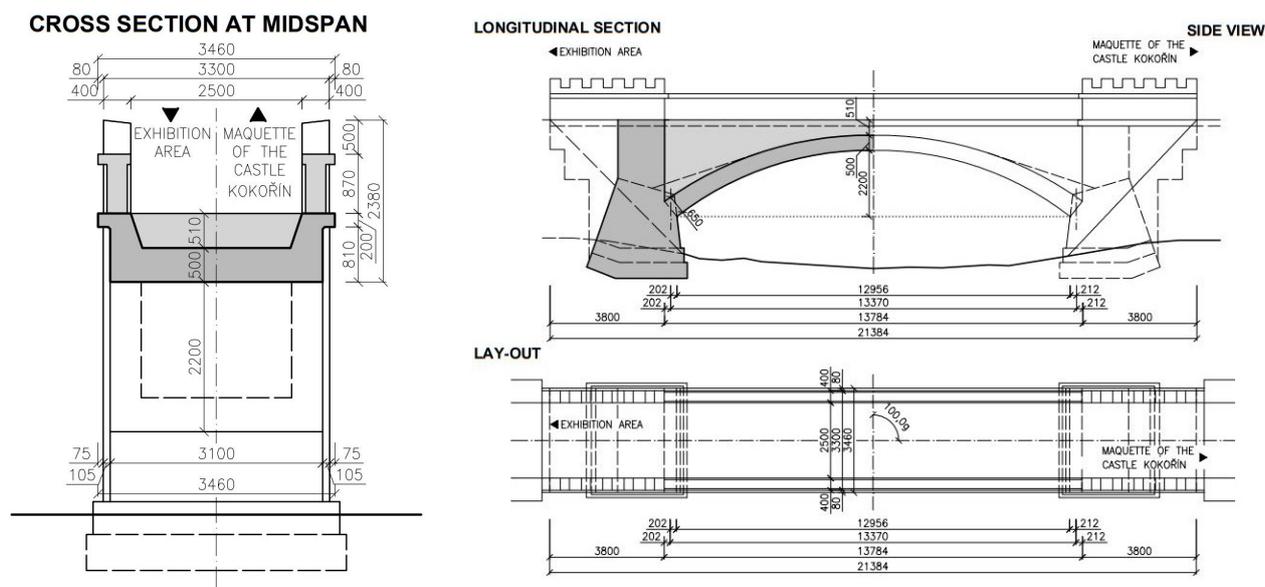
Concrete bridge at the Ethnographic Exhibition in Prague 1895.
